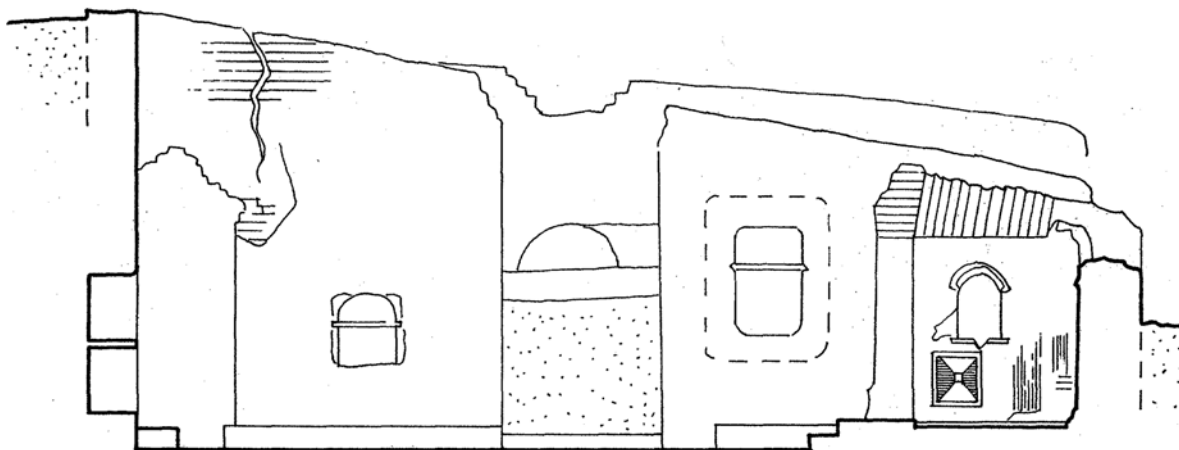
Ismant el-Kharab: Small East Church, east-west section (AA) through the centre of the church looking north through room 2 (drawing B. Rowney).
